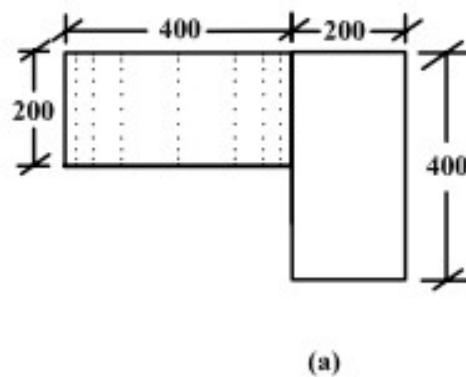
Cylindrical roof building models arranged in different L-Shape orientations
